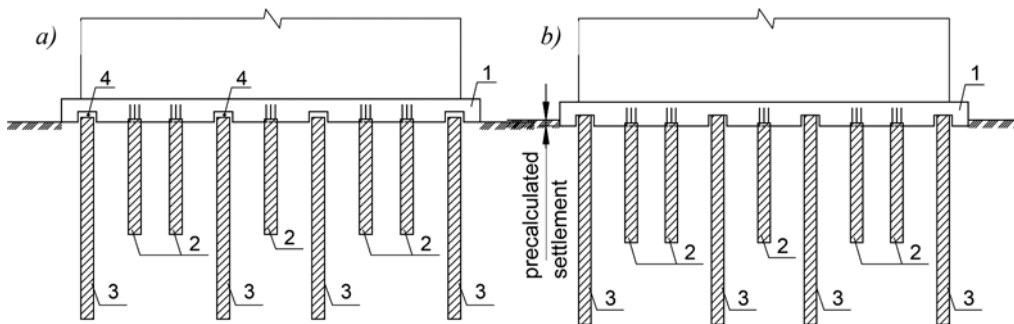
Method of construction of raft-pile foundations in seismic areas: a) the initial stage of deformation increment – the settlement of the slab rigidly combined with short piles; 1 – foundation slab; 2 – short piles rigidly joined with the slab; 3 – long piles separated from the slab by a design clearance 4; б) the final stage of deformation development is the involvement of long piles in the work of the raft-pile foundation (RU patent No. 2300604).
